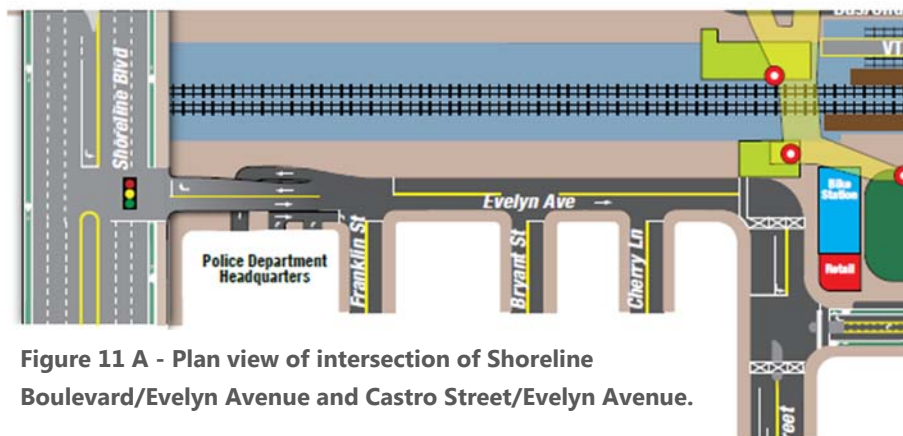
A - Plan view of intersection of Shoreline Boulevard/Evelyn Avenue and Castro Street/Evelyn Avenue.
